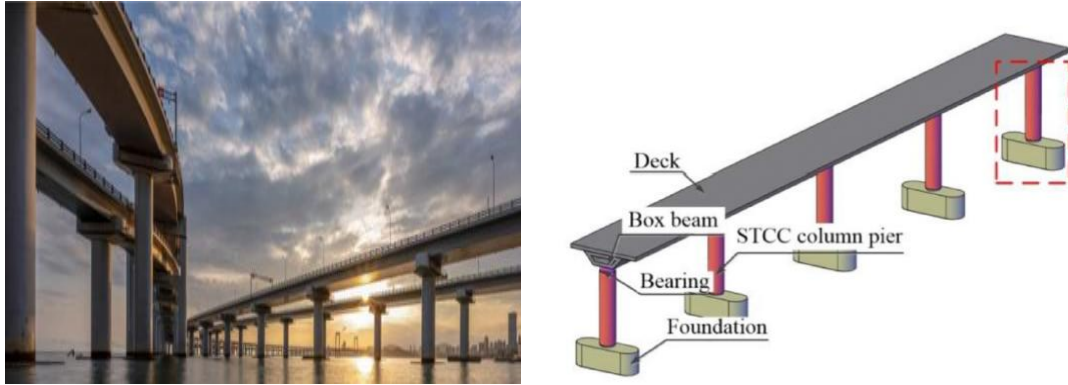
Xinghai bay bridge at dalian, China (Qiyun et al. 2021)
